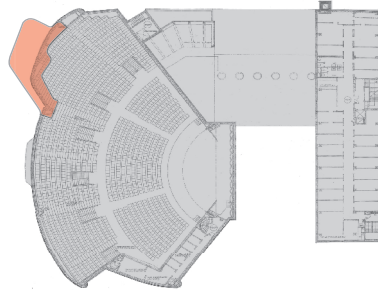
3rd floor floorplan of the House of Culture with addition. Original image by Wittenborg & Company, altered by the authors.
